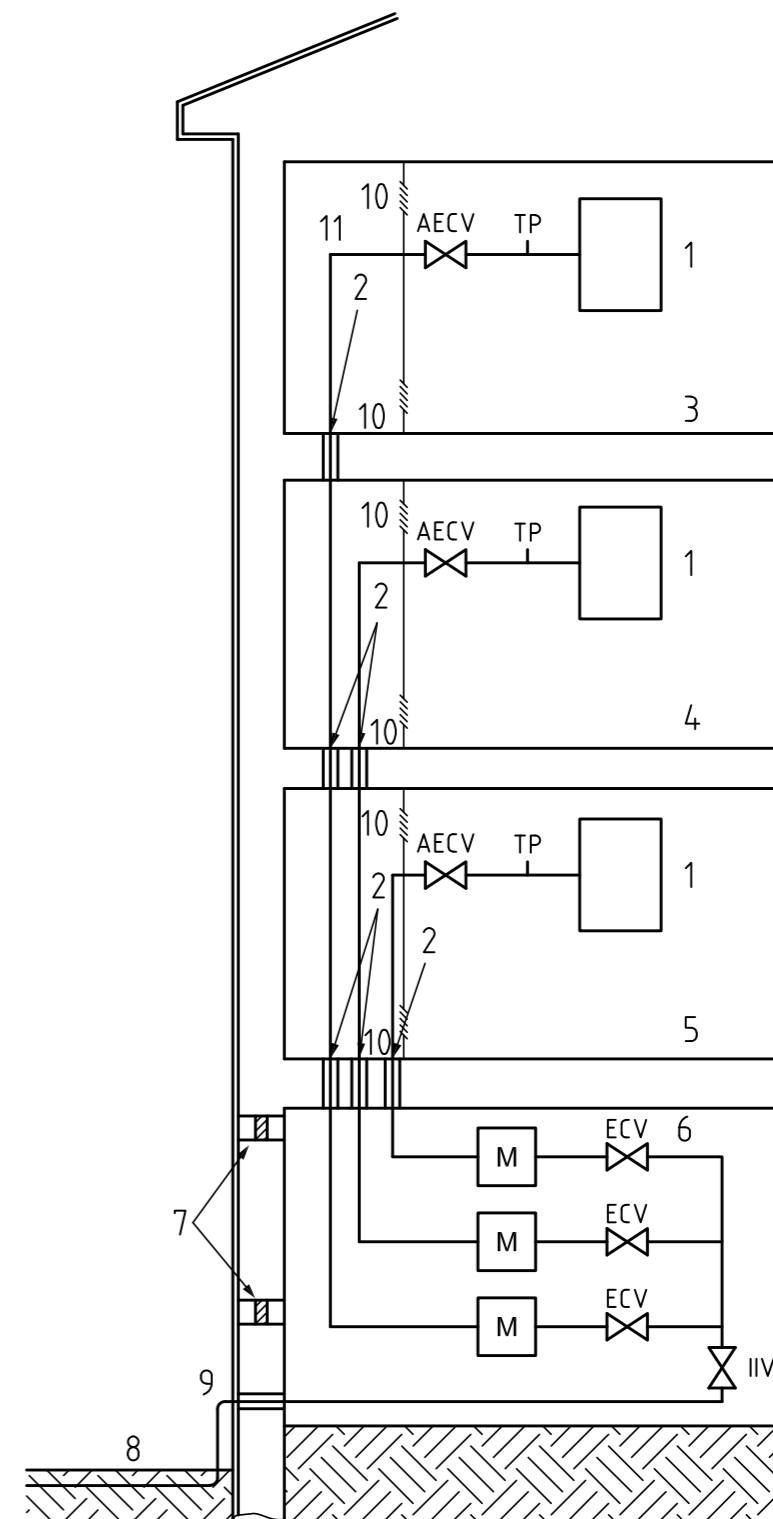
A - Typical installation pipework in multi storey buildings containing flats or maisonettes –
